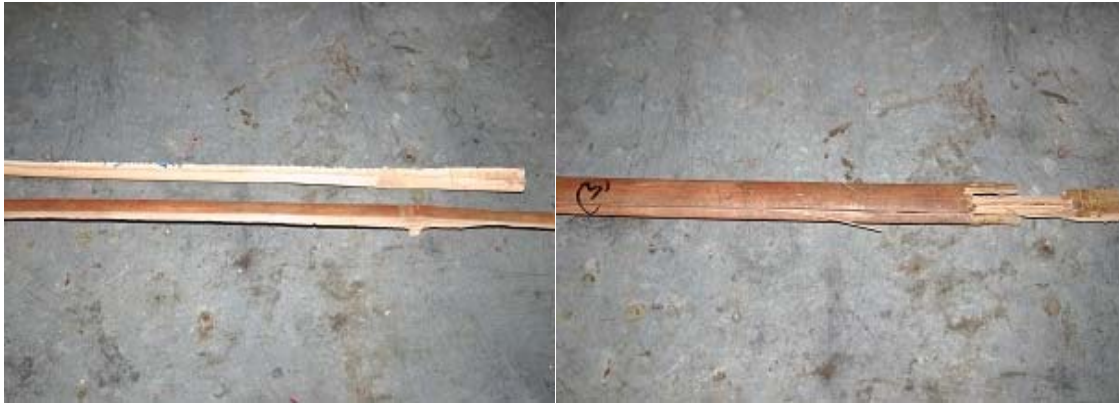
The failure patterns of specimens. The specimen on the left failed ideally by cracking, whereas the one at the right failed by the joint.
